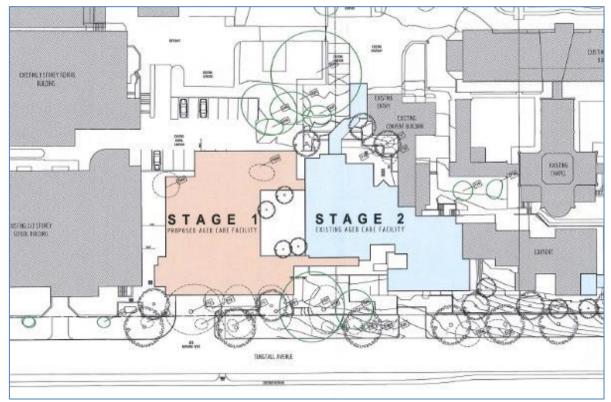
Proposed Staging Plan (NB: Stage 1 and 2 have now been combined into single stage)
